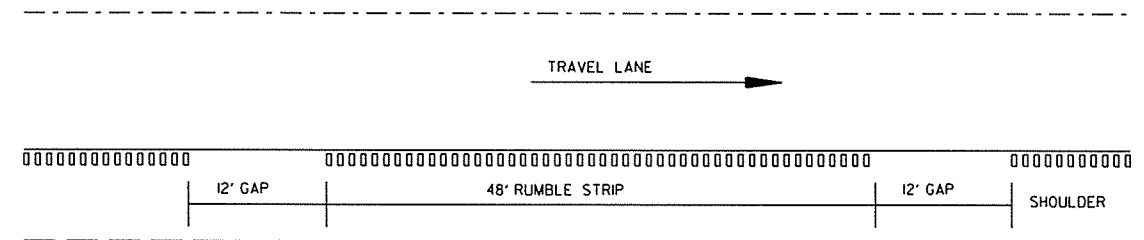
DETAIL FOR RUMBLE STRIP GAP AT DRIVEWAY TURNOUTS
